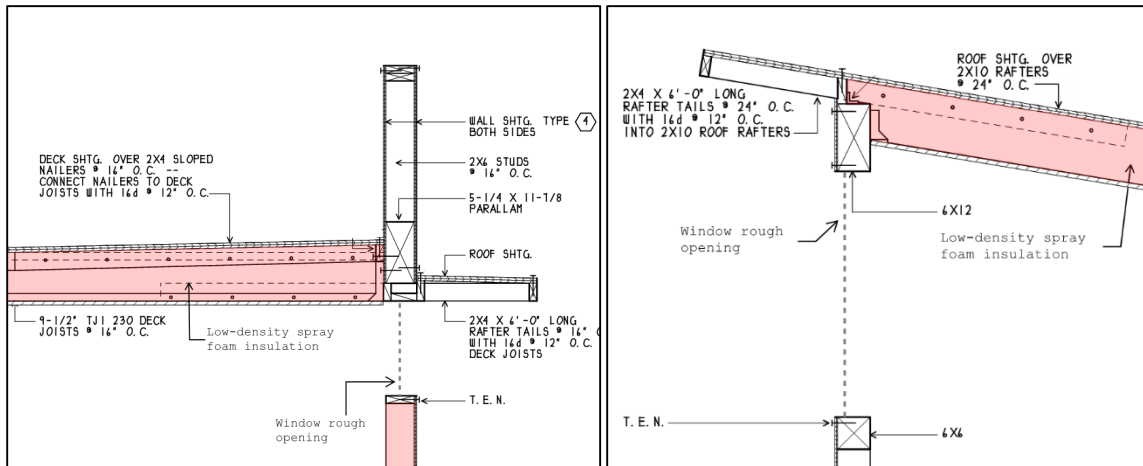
Roof details, below roof deck (left) and at sloped roof (right)
